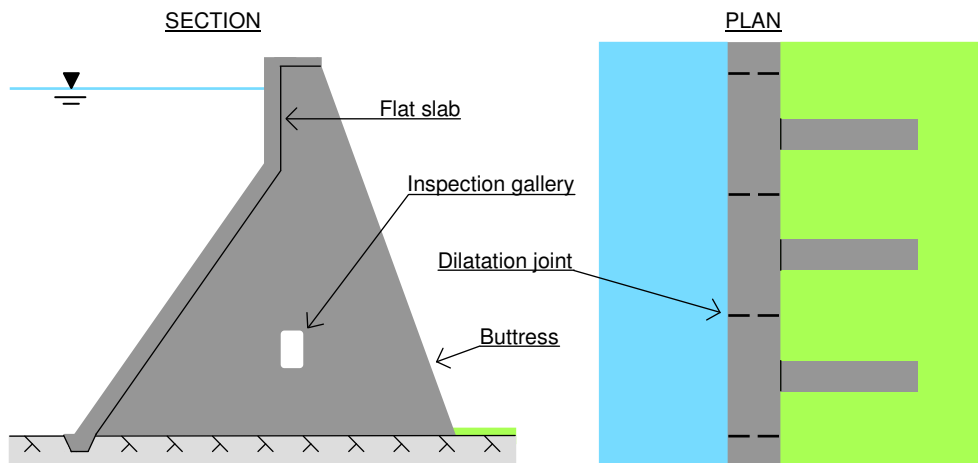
Section and plan of a buttress dam (hollow gravity dam).
